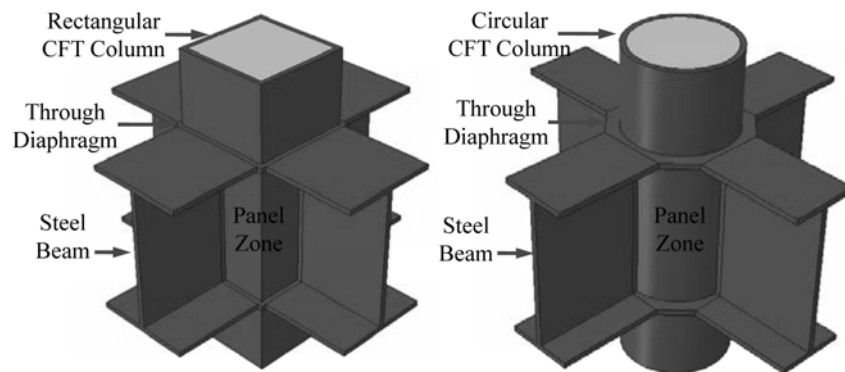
Typical steel beam-to-concrete filled tube column connections.
